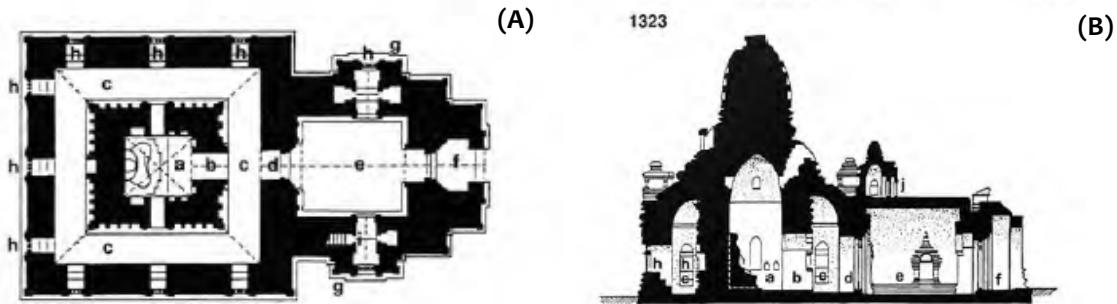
Plan and Sectional Elevation of a Temple with a Central Shrine and Corridor Around (Pichard, 1992)
